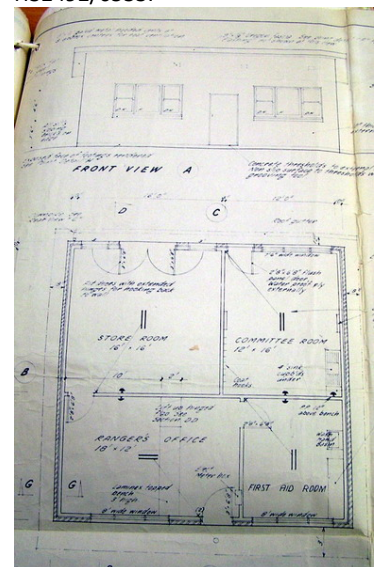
Floor Plan & Front Elevation of proposed Administration Building, 1 August 1965. Source: Crown Land file Rs 5154, DSE.
